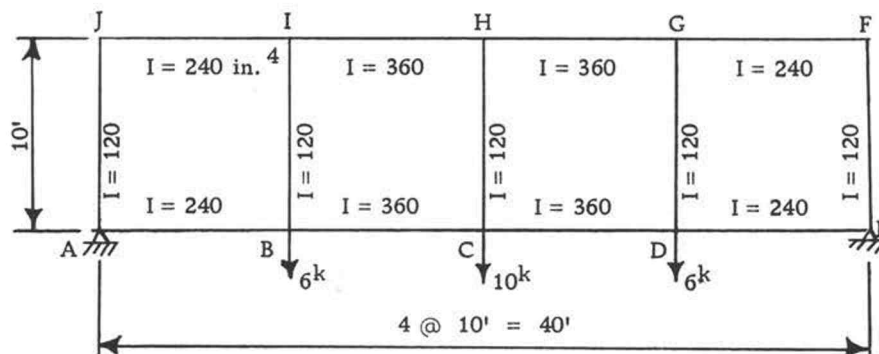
Symmetrically Loaded Vierendeel Truss
